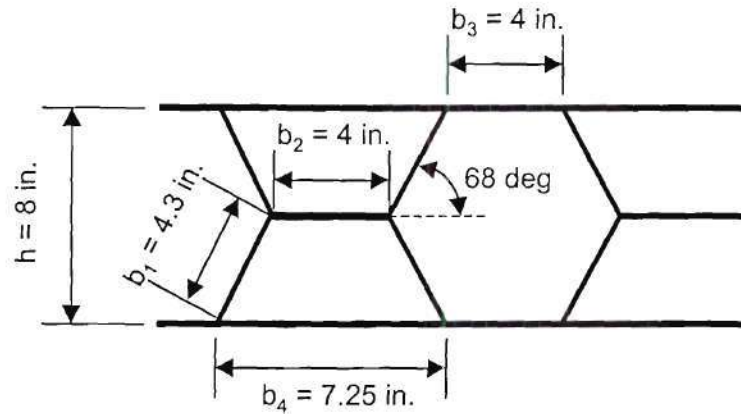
Cross-section of WVU FRP bridge deck (GangaRao et al., 1999)
